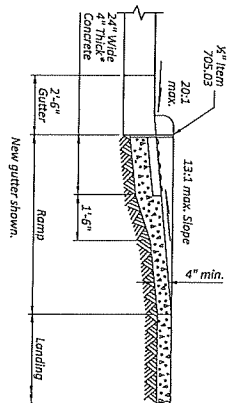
DETAILS: Contractor is to ensure the base of each constructed curb ramp allows for proper drainage to the gutter. Provide a minimum 2% slope from the gutter, and 2% gutter and ramp, one not allowed.
